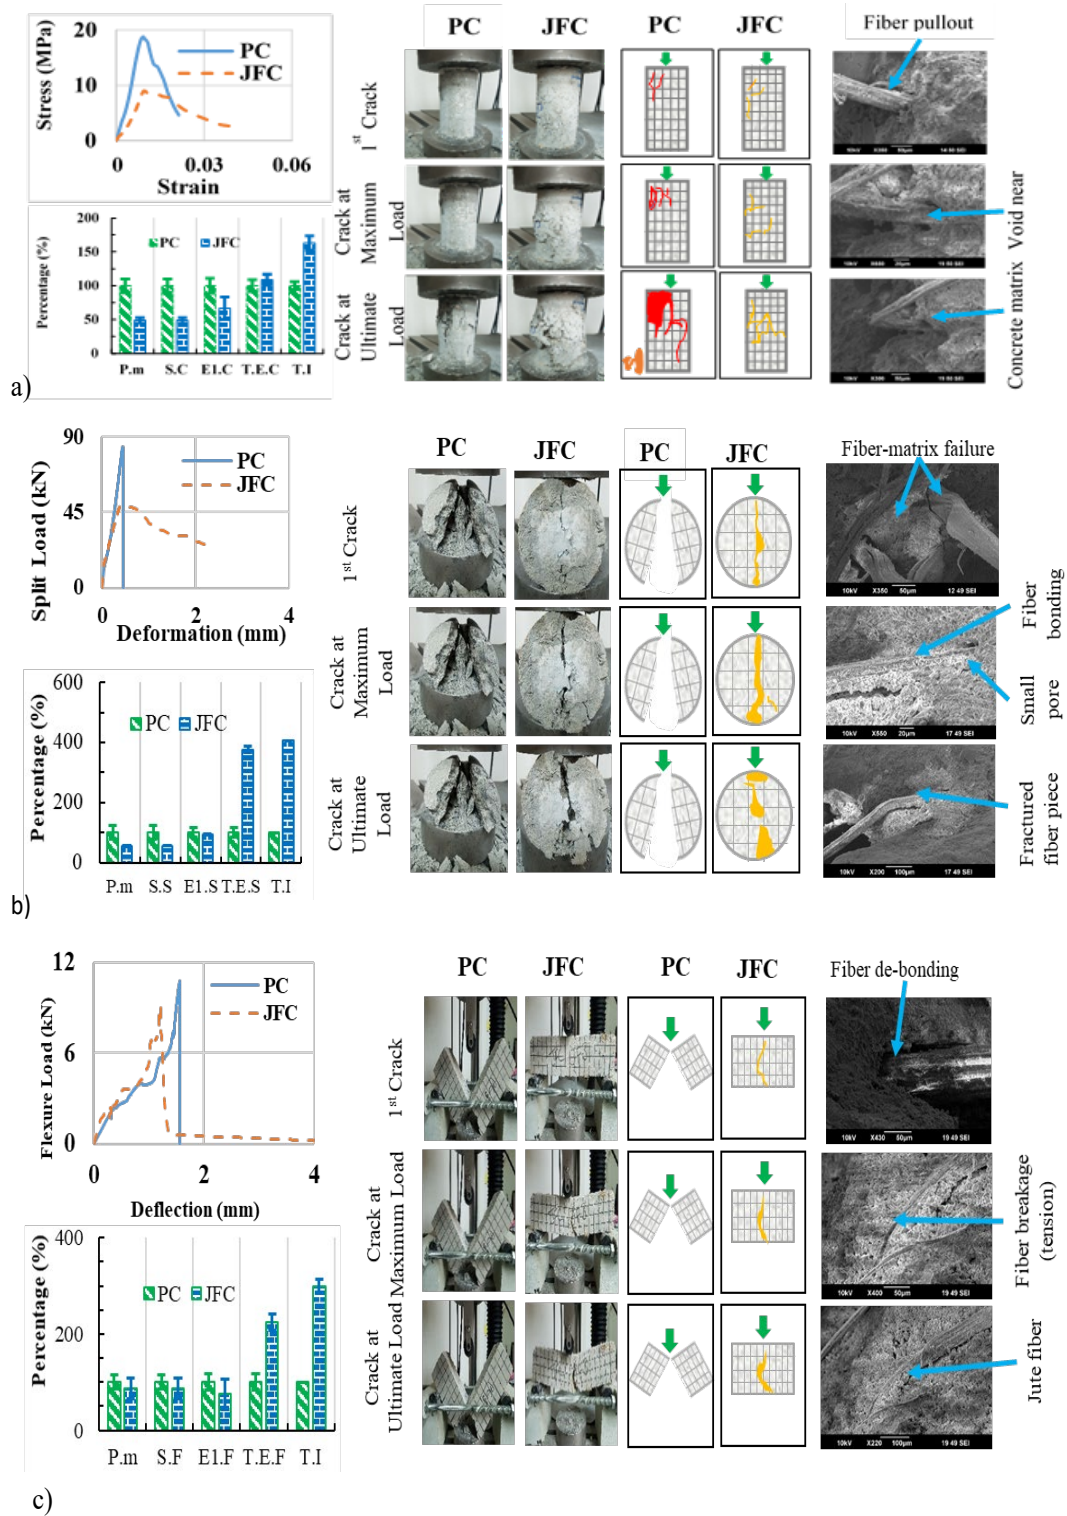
Mechanical properties under; a) Compression loading, b) Splitting loading and c) Flexural loading
